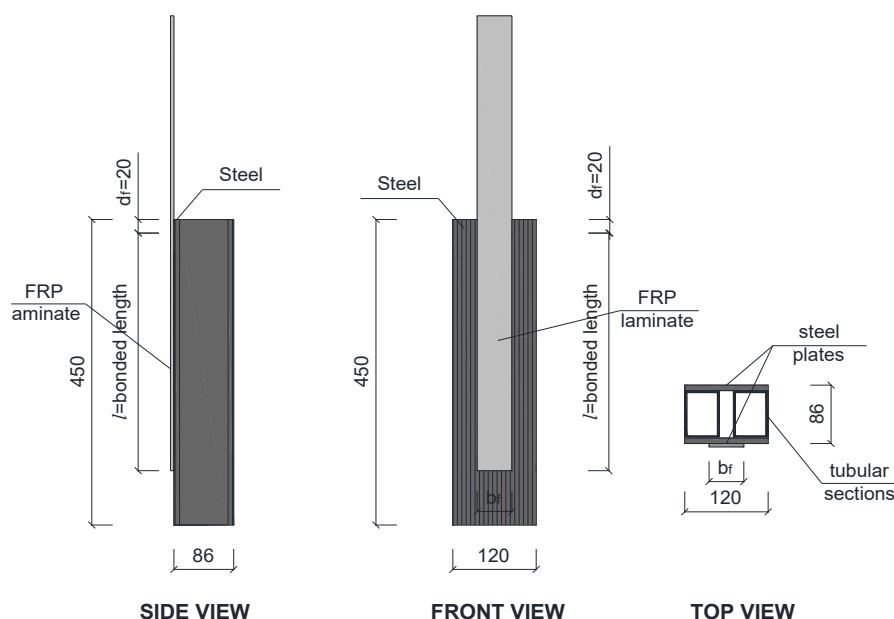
Specimen Dimensions and Details of Bonded FRP system (FRP-to-steel specimens). Dimensions in mm.
